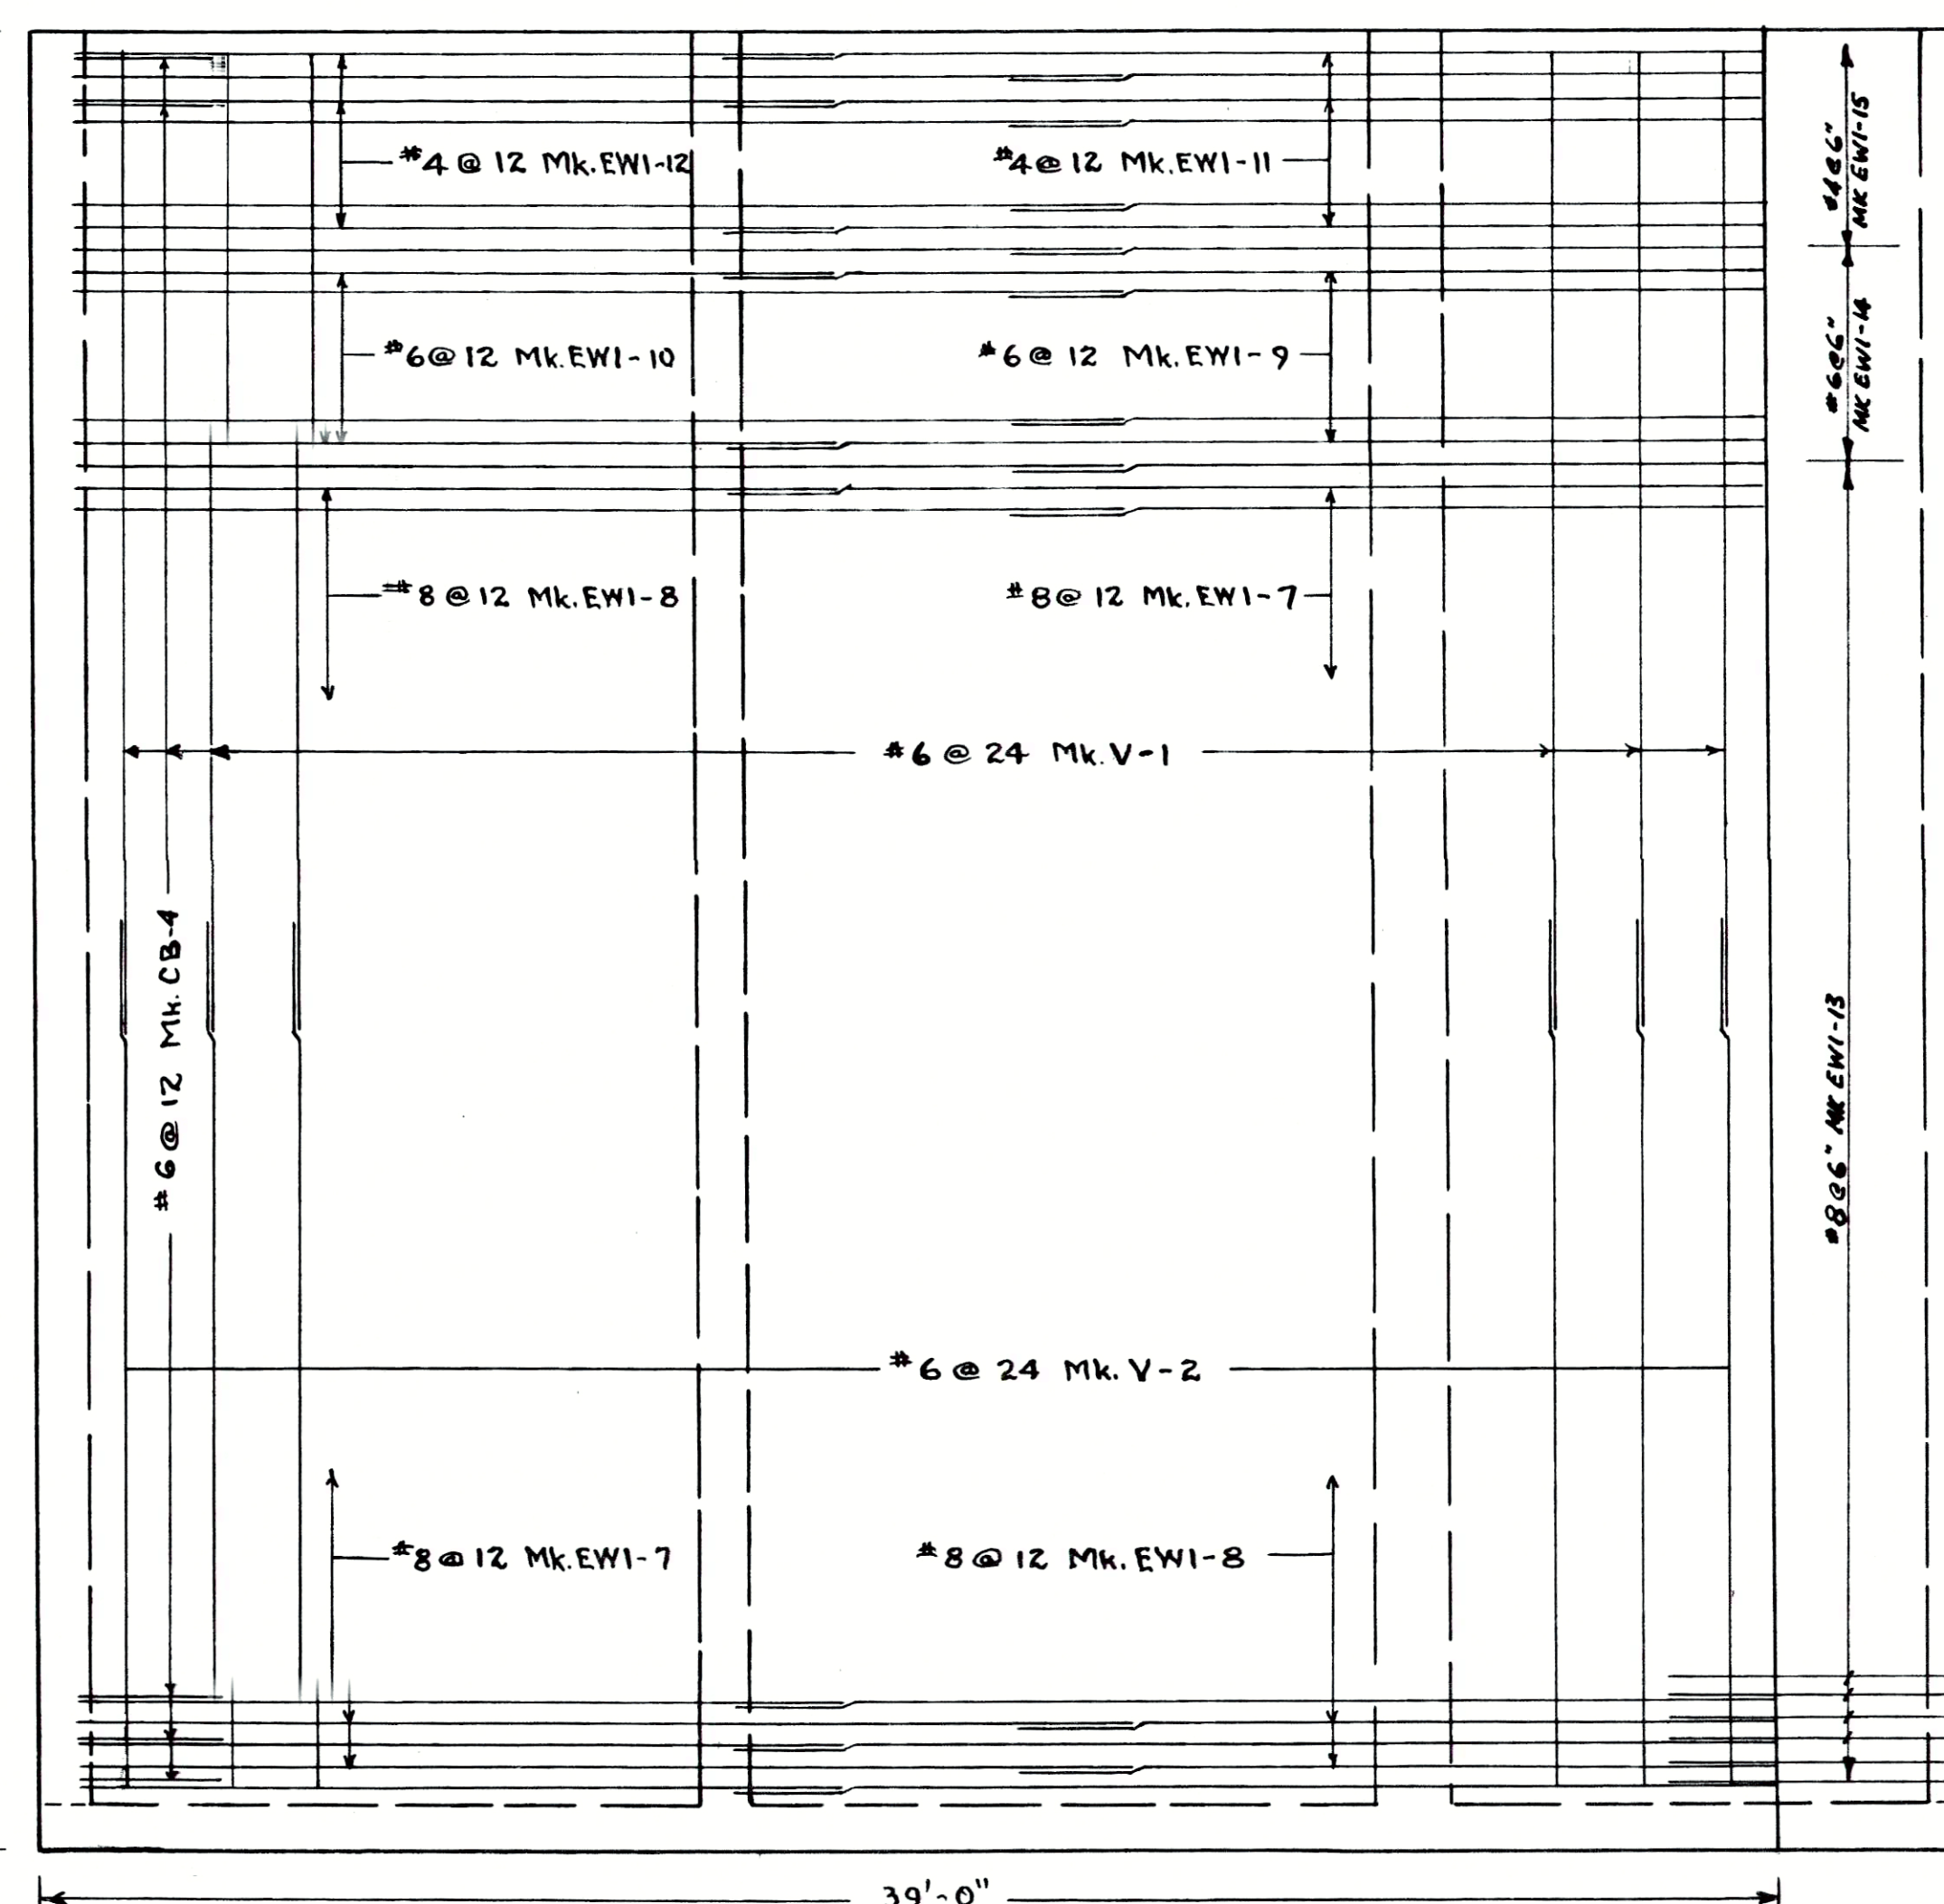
DETAIL OF OUTSIDE STEEL - END WALL - CRIBS 1 & 5
